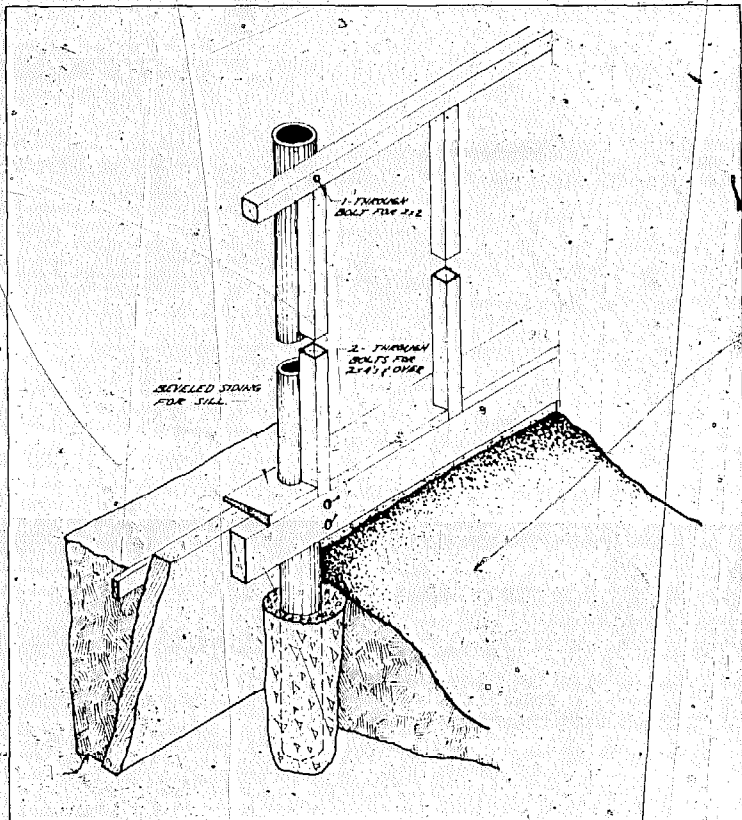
B Metal post foundation with lightweight kneewall glazing support
